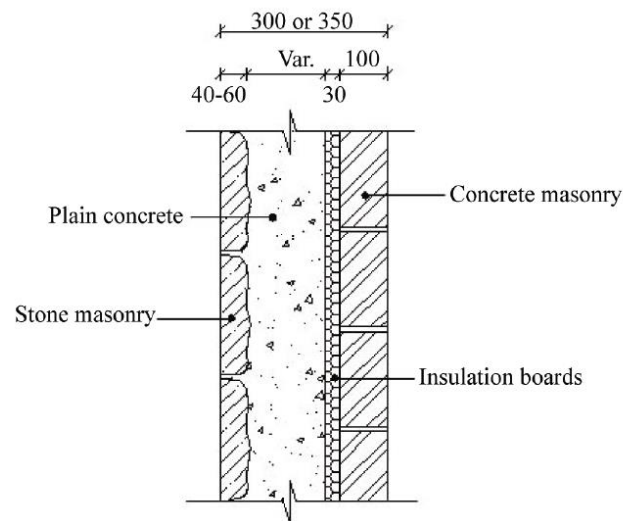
Typical Cross-Section of the Stone-Concrete Infill Panel, Dimension in mm (Al-Nimry et al., 2015).
